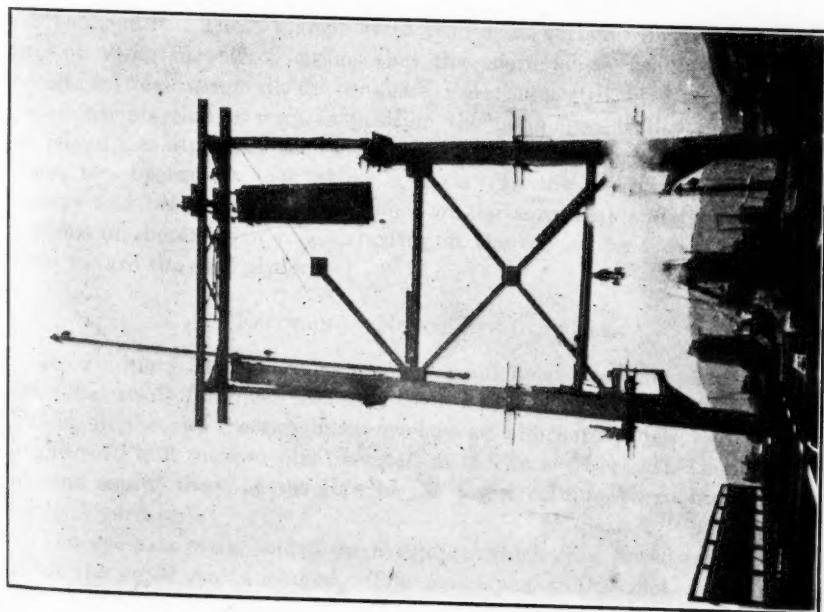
VIEW SHOWING ERECTION OF EIGHTH SECTION OF
